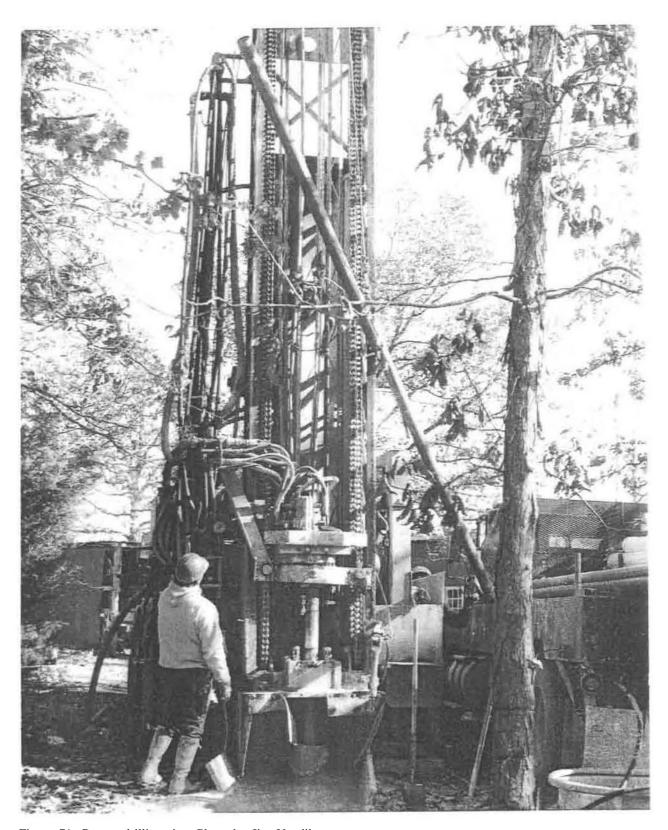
Rotary drilling rig. Photo by Jim Vandike.
